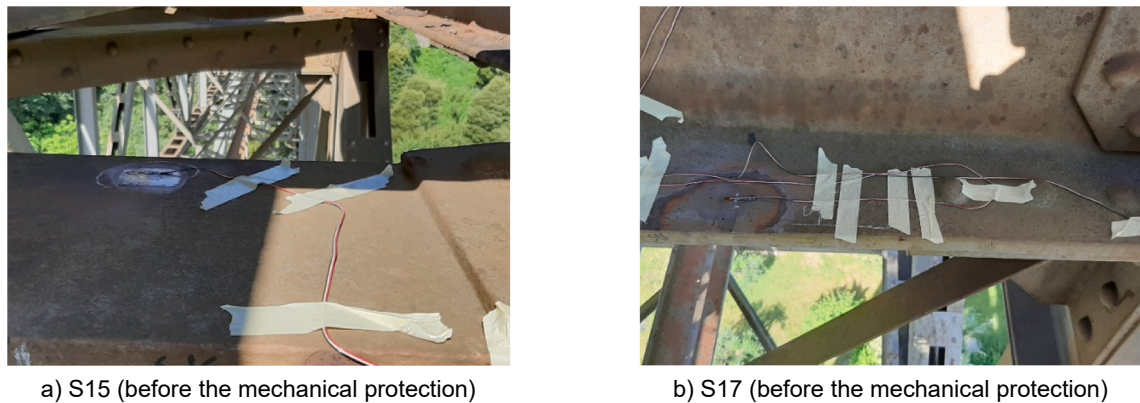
Strain gauges installed on the cross-sections close to column P3 ($x=104.50$ m).
